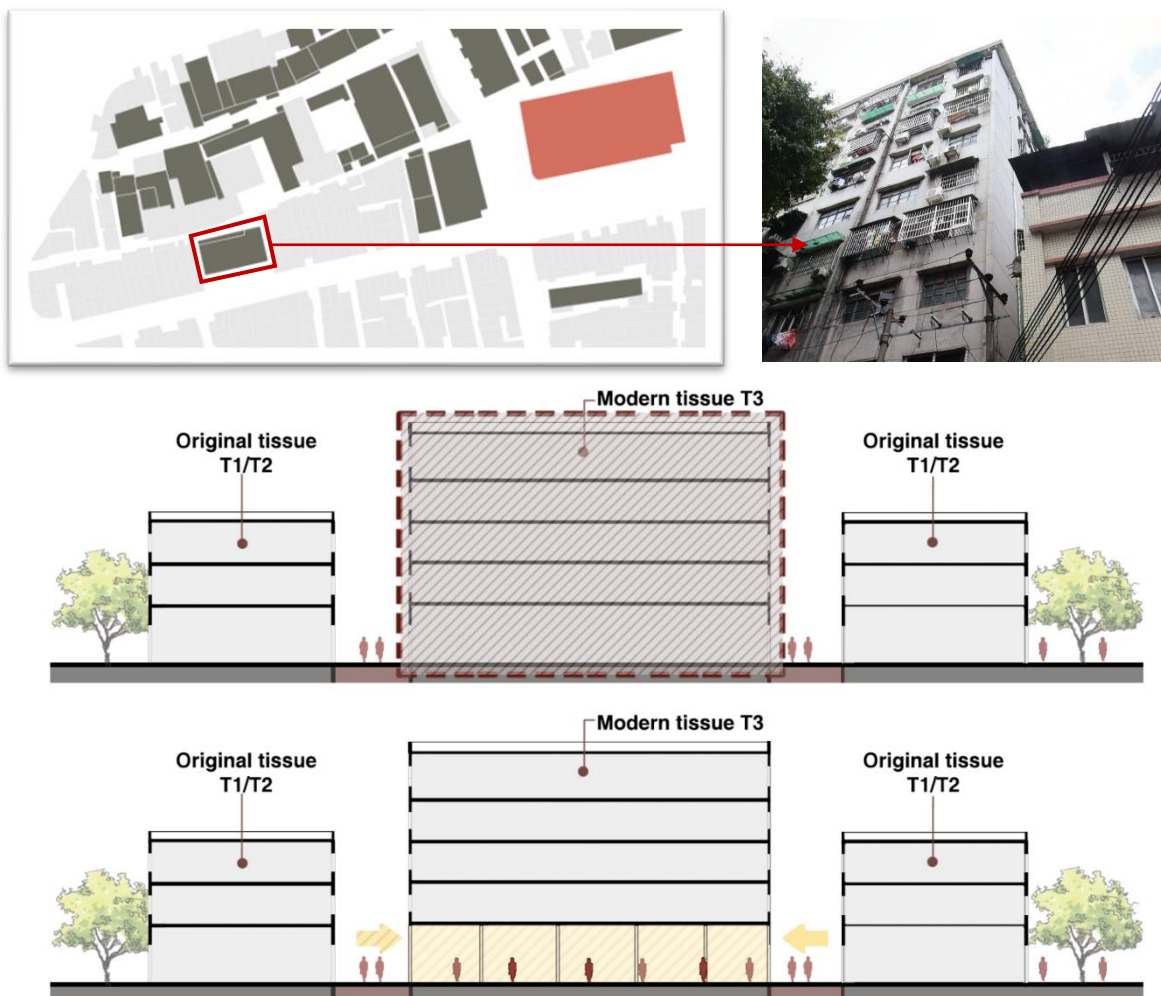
Detailed intervention for T3#2 (Source: the author)
